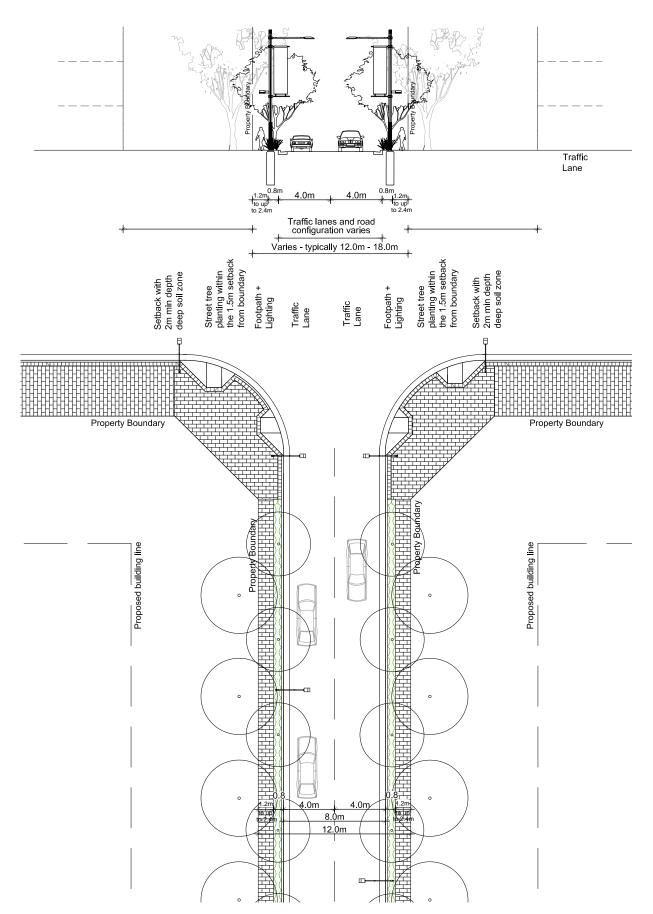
Typical Layout - Mixed Use, Commercial, or Business Character Street (NOT TO SCALE) e.g. Tertiary Road - Julius Avenue - typically 12 to 18 metres in wide
